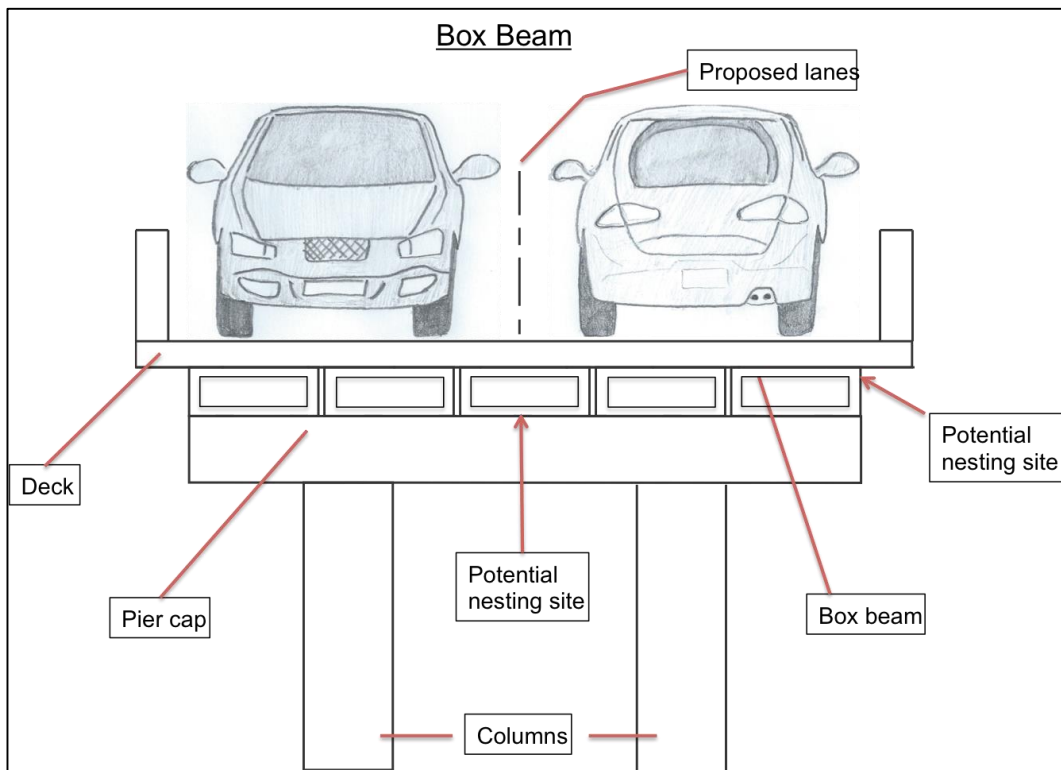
Cross-section of a concrete box beam bridge with potential nesting sites
